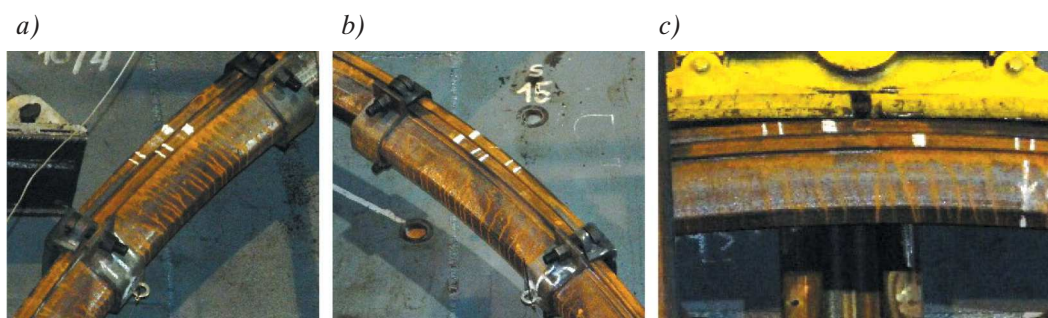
Slide on support's frame joints: a) left side; b) right side; c) center
